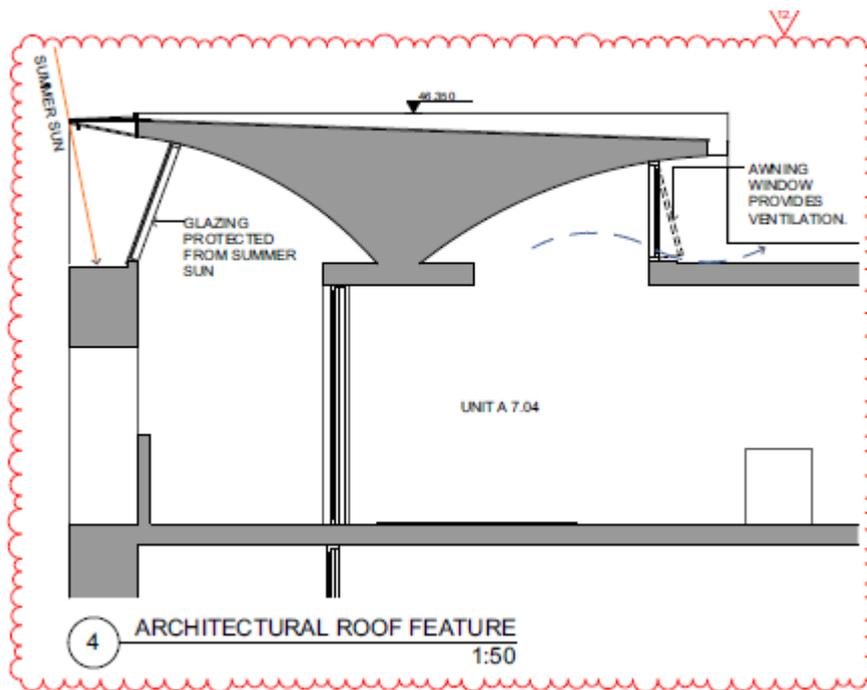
Section through skylights showing how architectural roof feature works to provide ventilation, sunlight and solar protection
